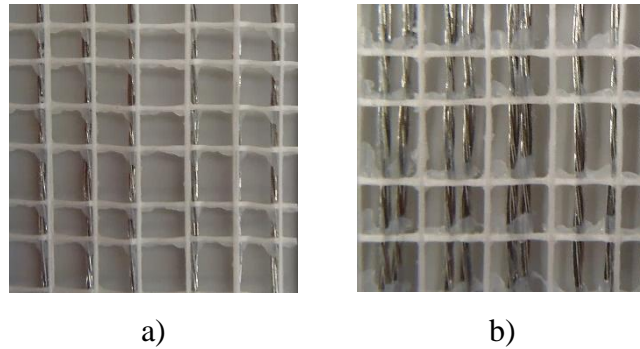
Textile reinforcements: a) Steel Sheet G6; b) Steel Sheet G12
